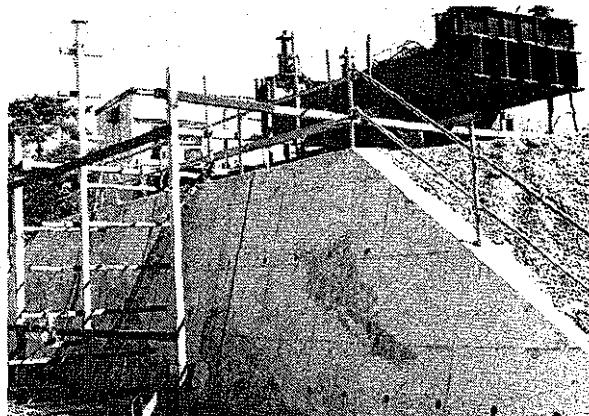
Static loading test on the slope of test embankment, cut by the newly developed soil nailing method.
